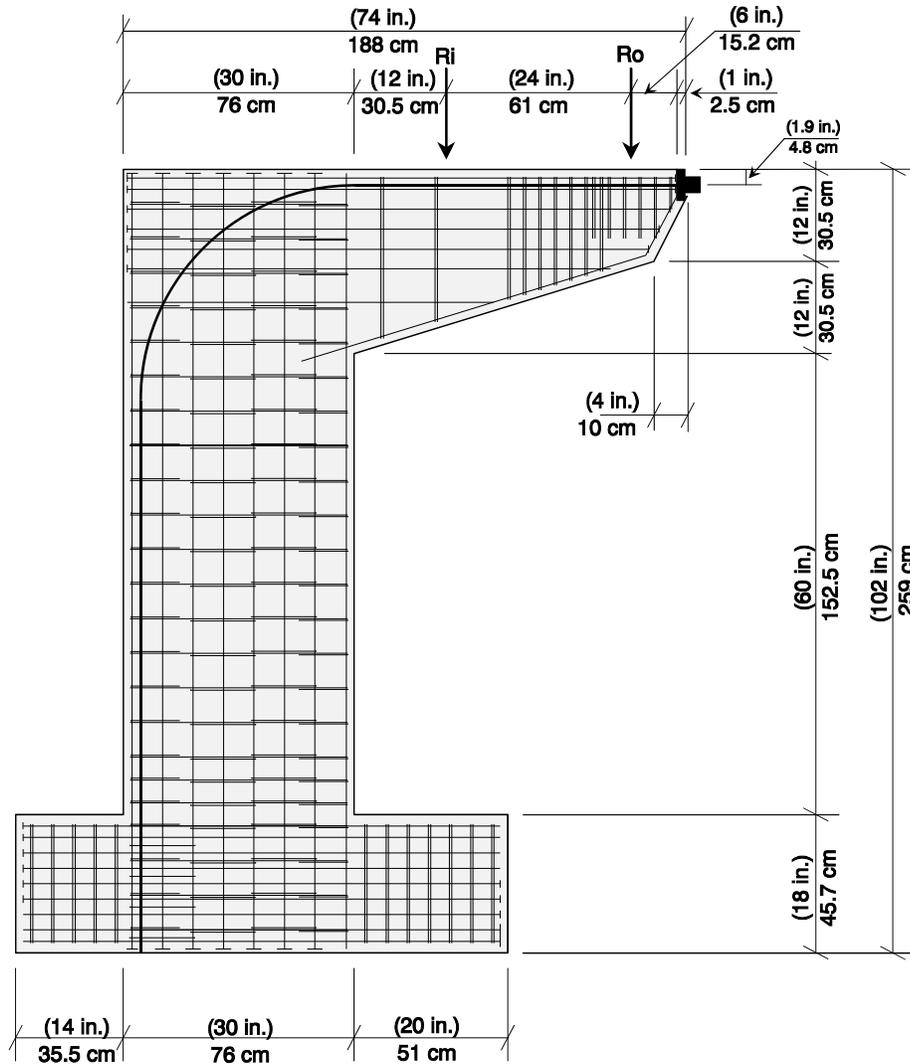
POJ-PU-54-TH overall reinforcement details
